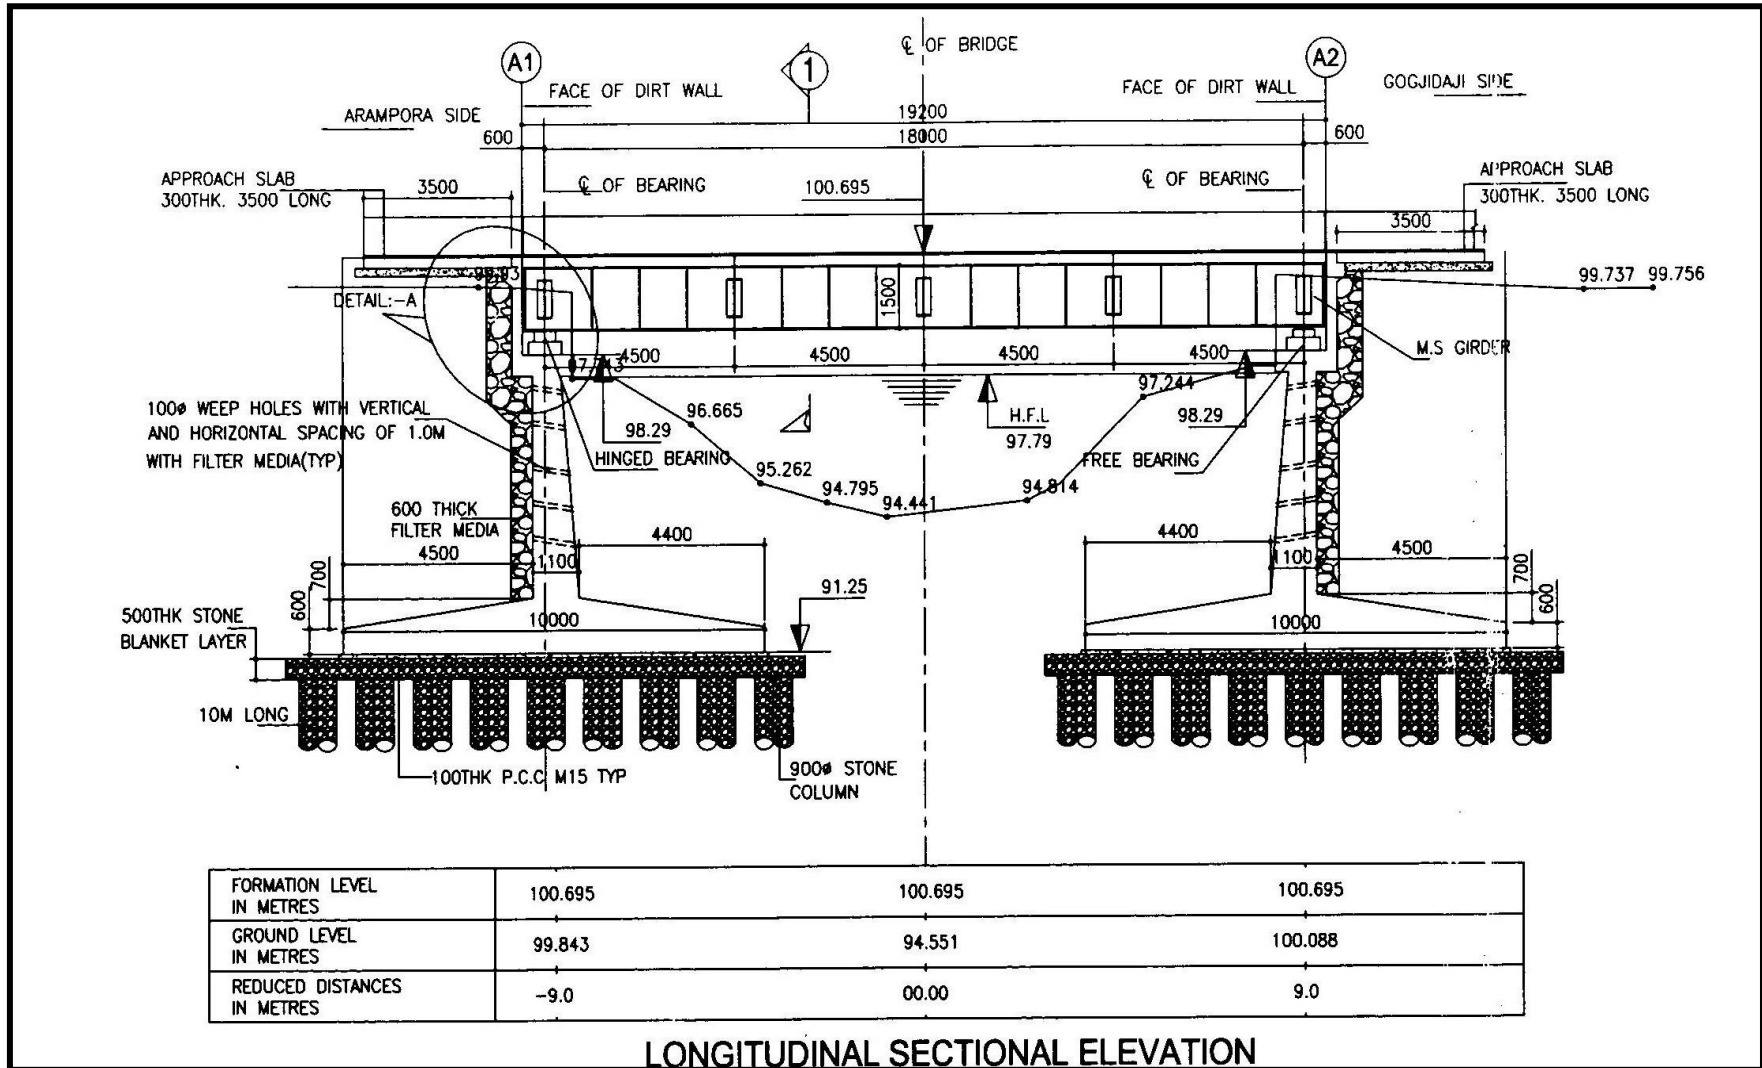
General Arrangement Drawing (GAD) for Proposed Bridge at Gogjidadhaji Tarzoo
